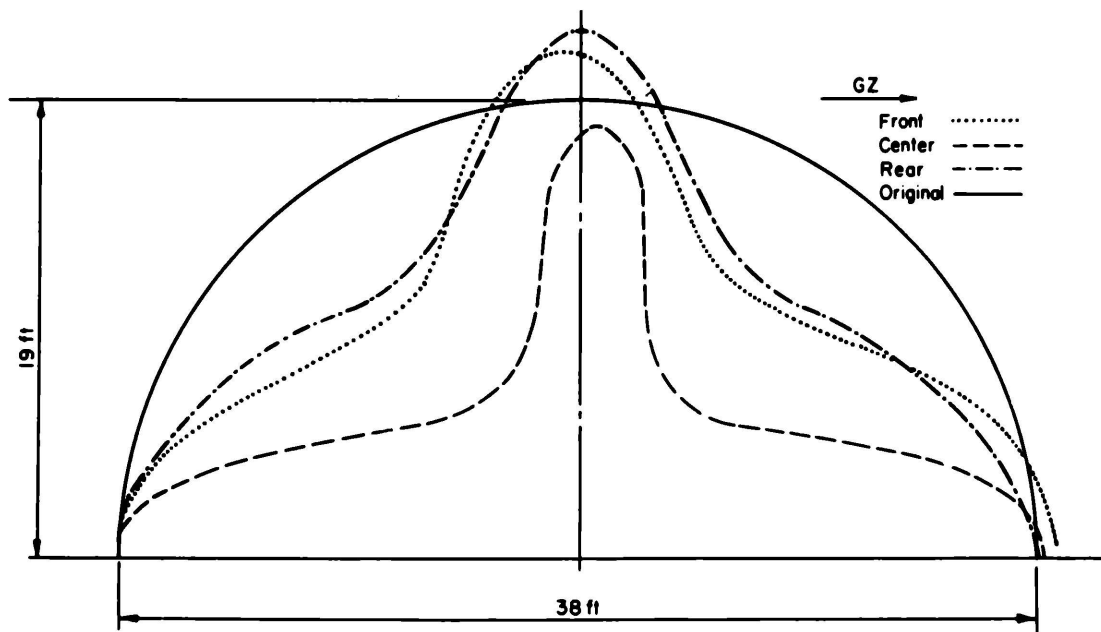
Structure 3.2d, profiles of deformed arch shell at front, center, and rear.
